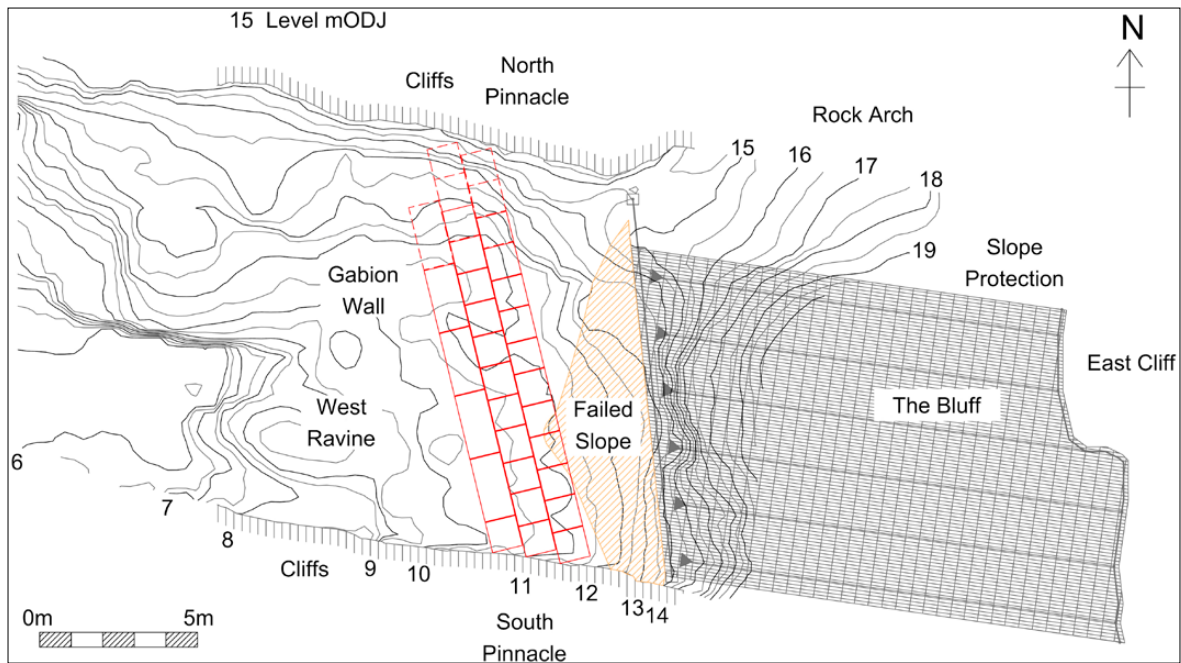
General plan of site conservation measures. Failed Slope is a Head deposit, the gabion wall will protect the Pleistocene sediments from storm surges and a rising sea-level. © Geo-Design Consulting Engineers Ltd.
